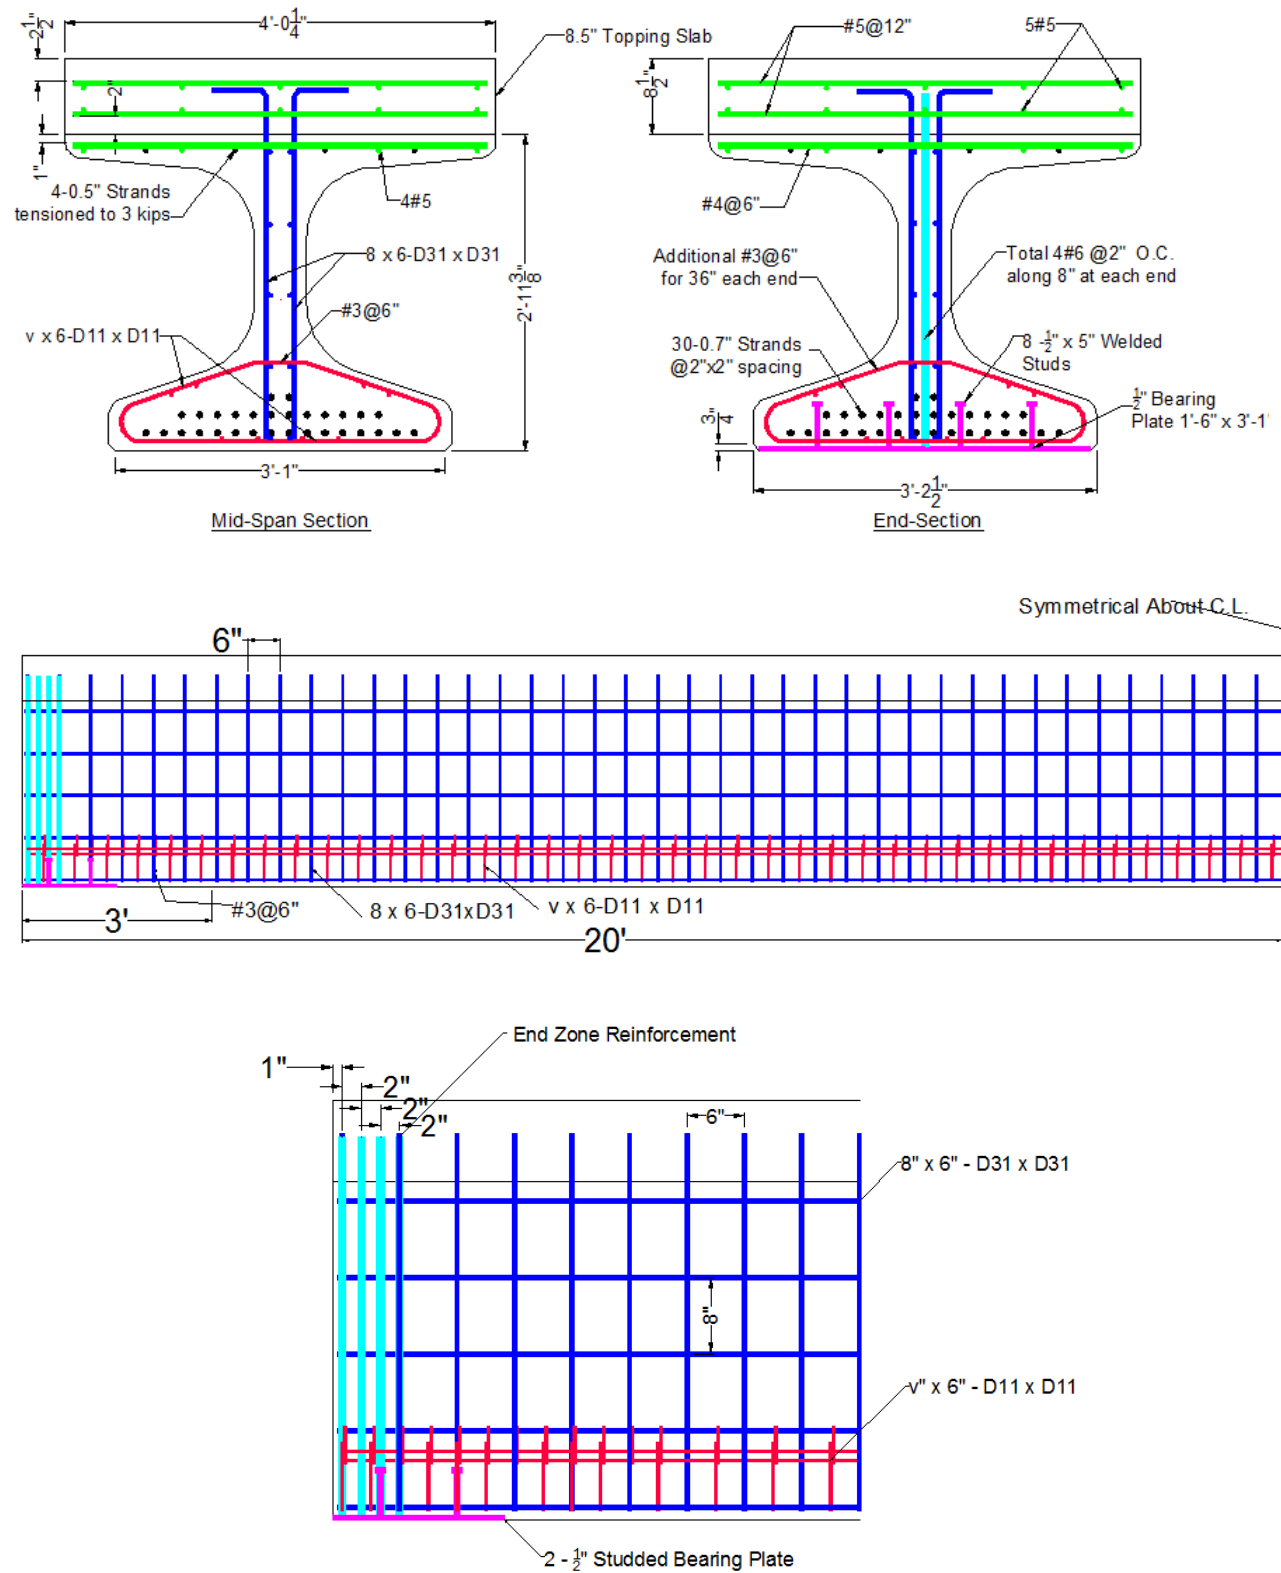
Dimensions and reinforcing details of NU900 girder specimen
